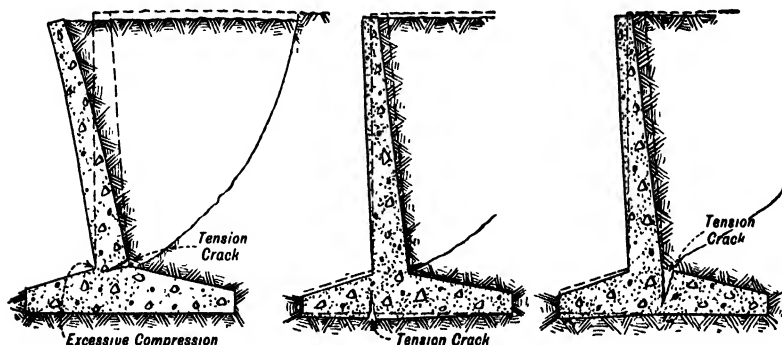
Failure of Component Parts of Cantilever Wall. (See p. 852.)
